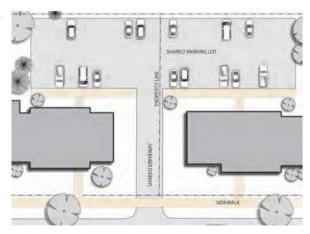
Shared curb cut and parking areas. Shared curb cuts and parking areas limit the number of driveways needed on busy streets and help to reduce the amount of paved parking area.
